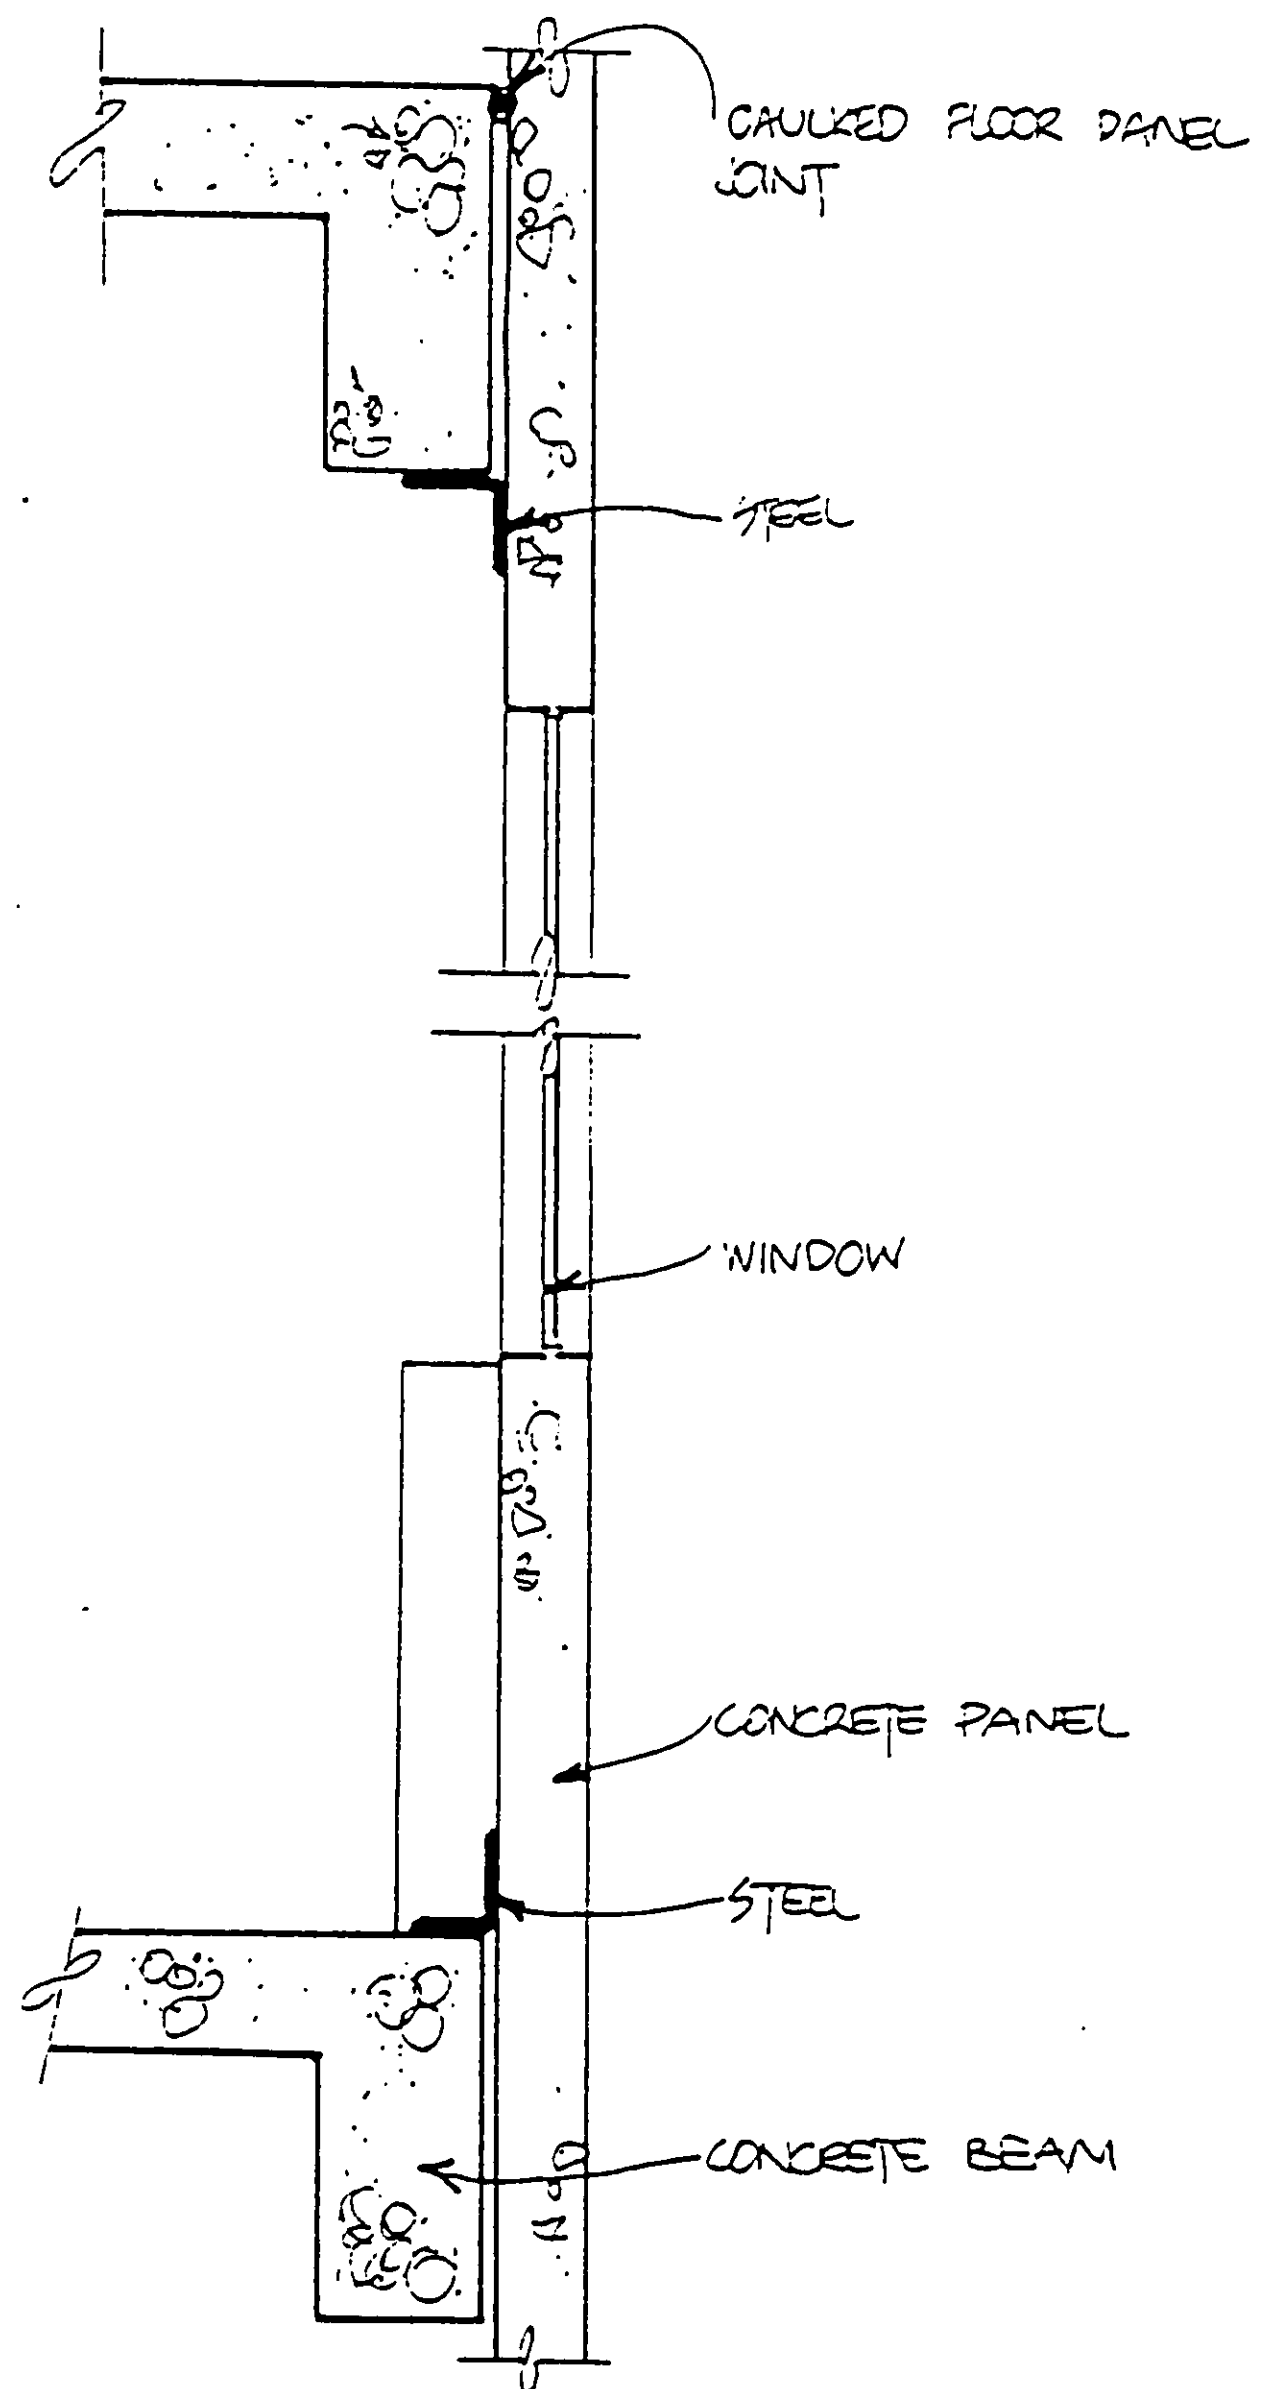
SECTION THROUGH CONCRETE FRAME ,
